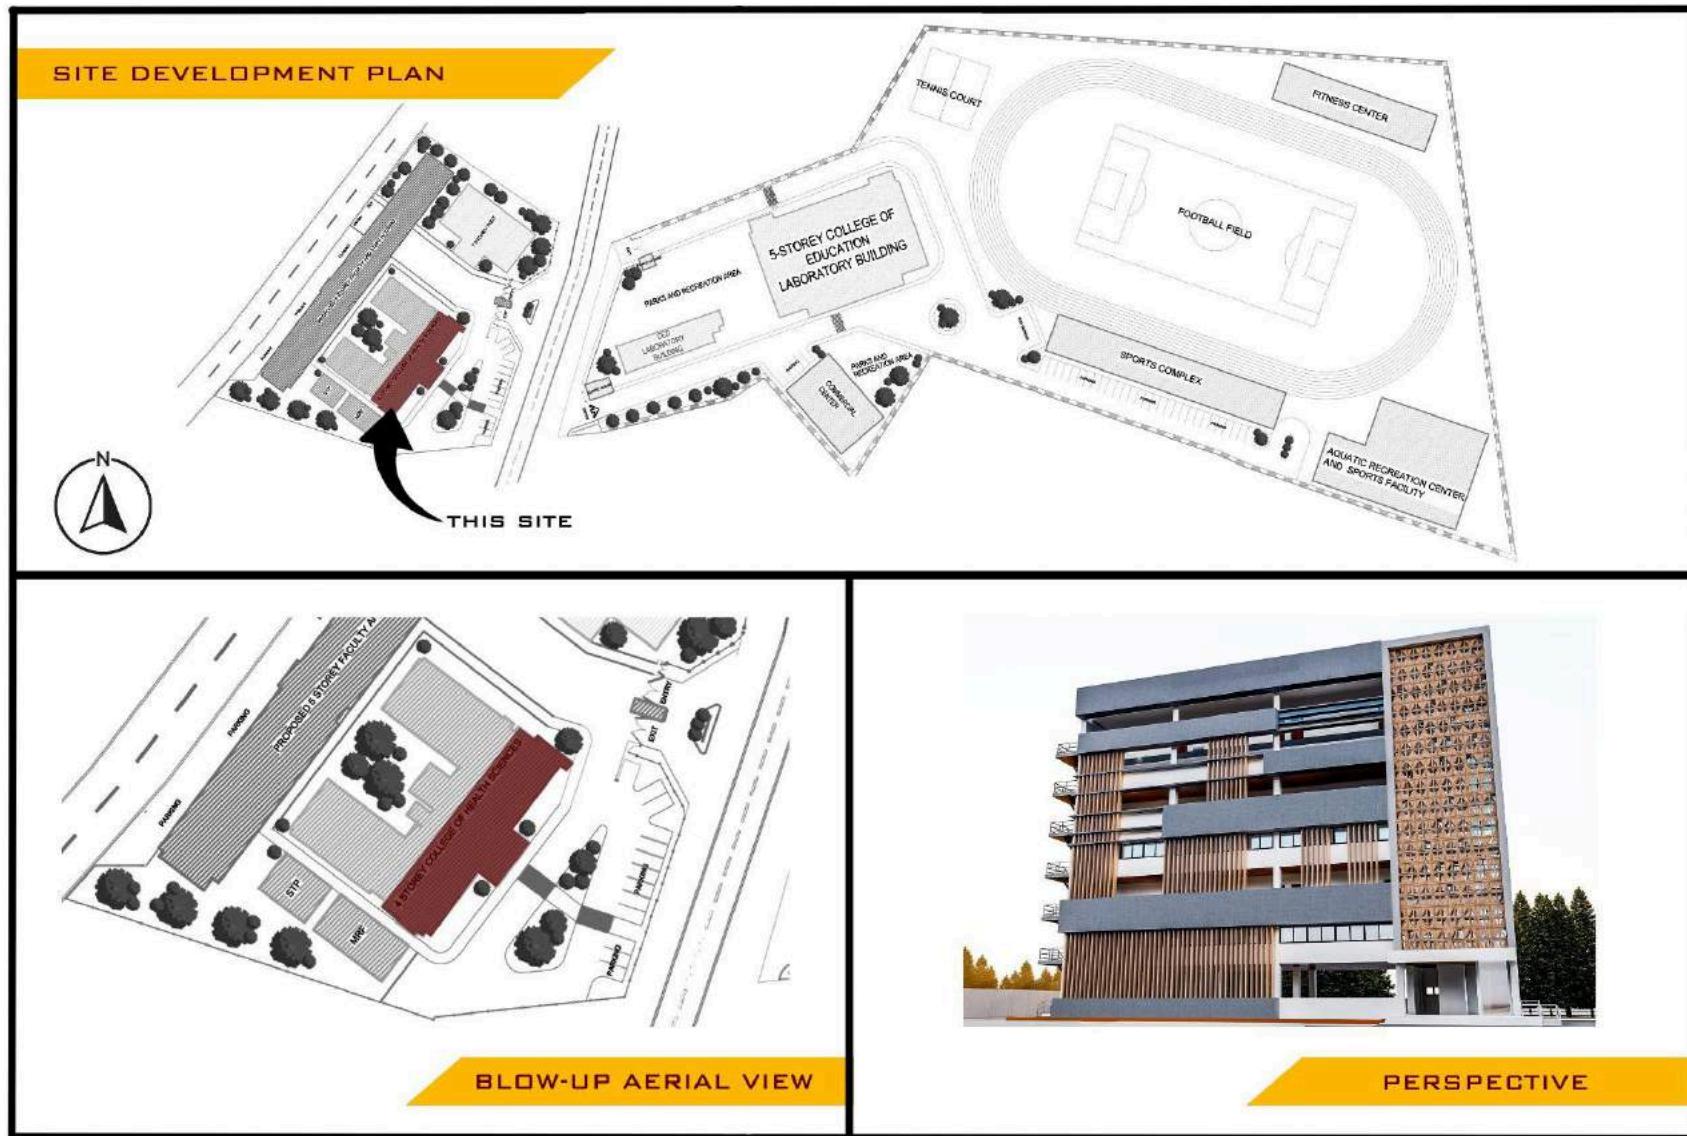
MSU-IIT Hinaplanon Campus Annex 10-Year Site Development Plan
